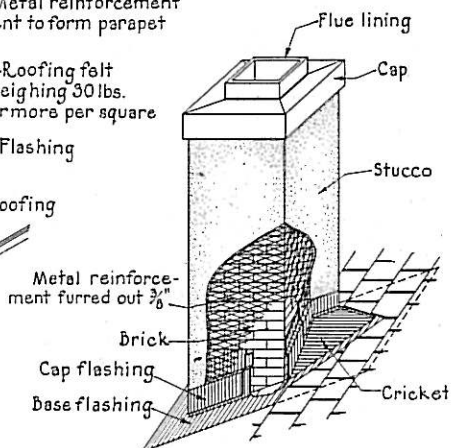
DETAIL OF SPANISH TYPE CHIMNEY WITHOUT TOP
